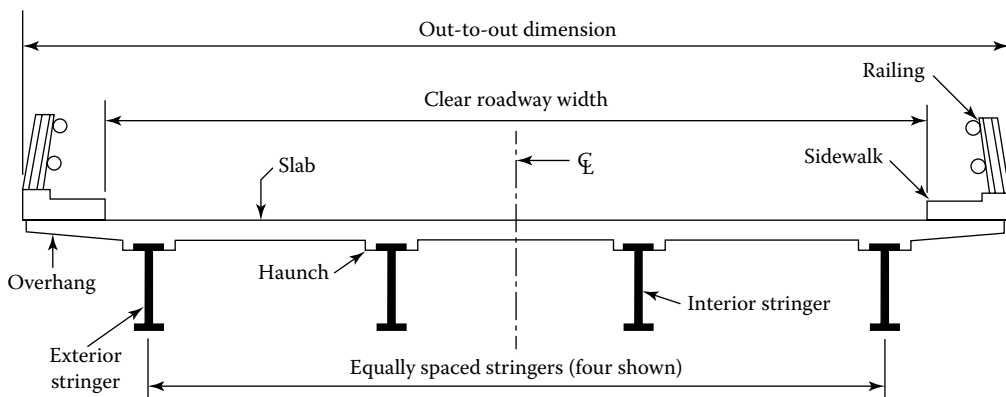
Superstructure Type *a*: cross section of slab-steel beam bridge. The cast-in-place concrete deck is built to act compositely with the WF steel beams or plate girders.
